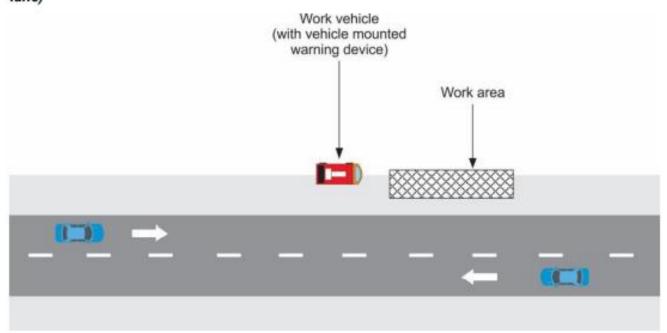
(b) - Short term works outside a traffic lane (works greater than 1.2 m from a traffic lane)
